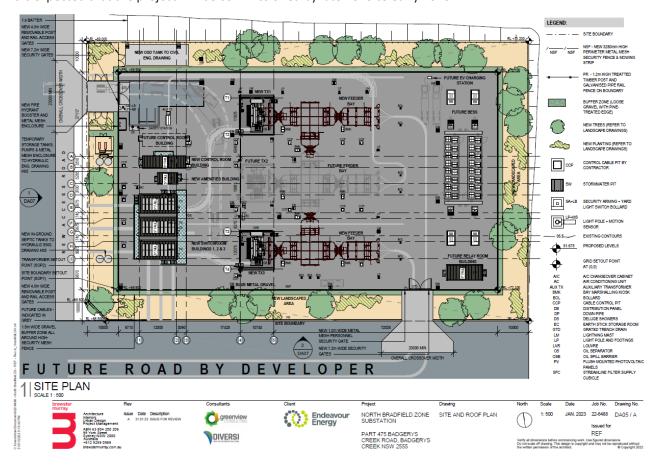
Design of North Bradfield Zone Substation (Source: Brewster Murray Architects)
